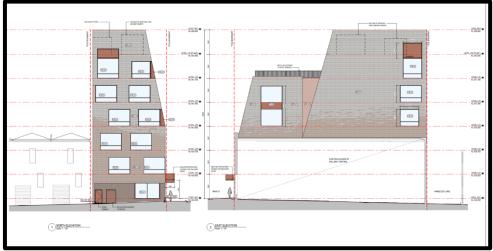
Proposed North and East elevations site development plan. Source: Application documents
